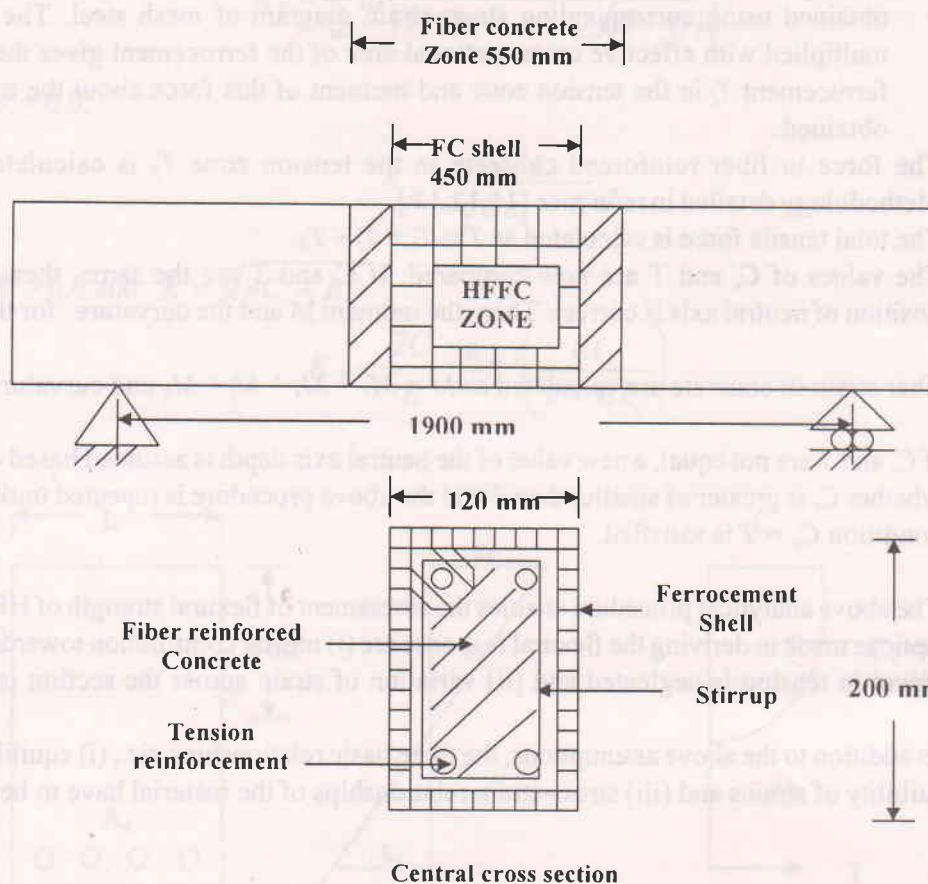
Detail of mesh zone and fiber concrete in the beam
